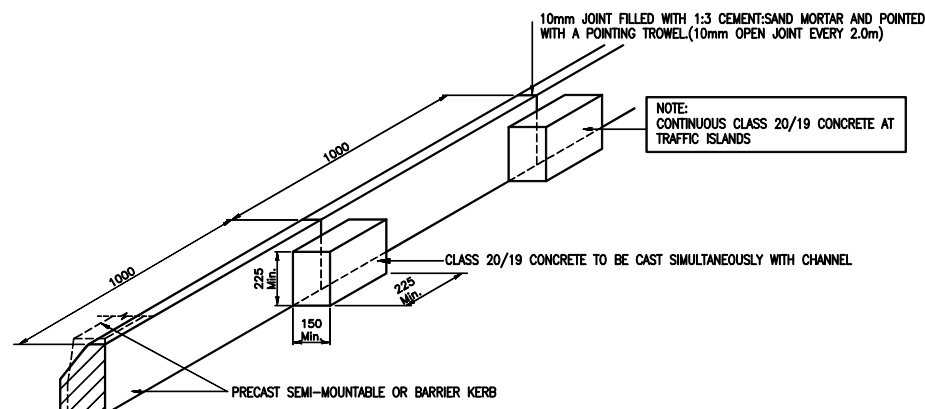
DETAIL OF SEMI-MOUNTABLE KERB (FIG7)
